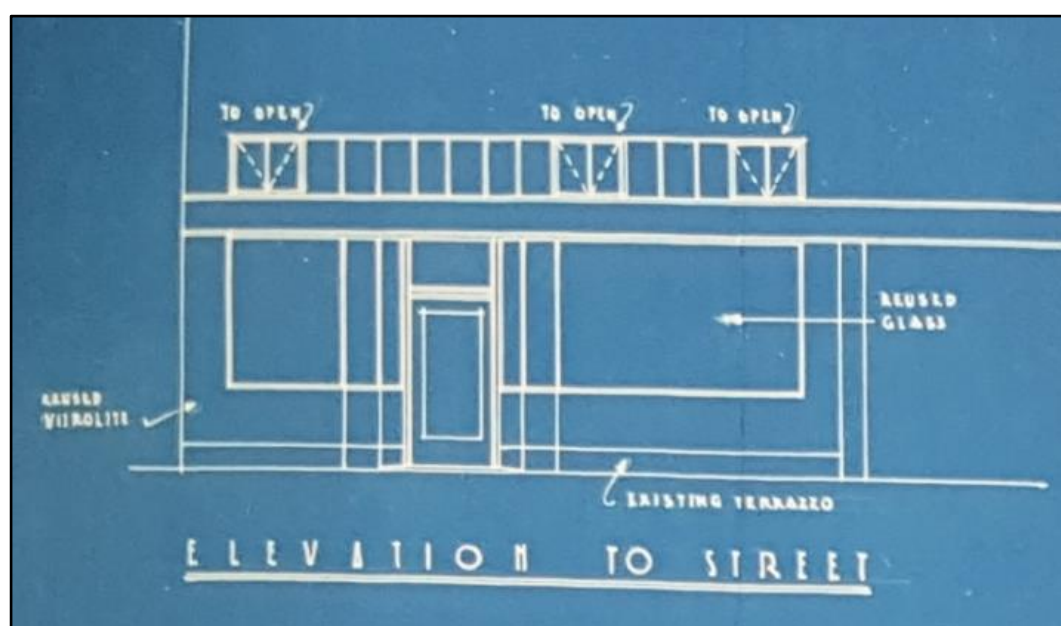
Detail from 1949 plan of alterations to the street façade of the eastern shop in the Temple Chambers at 45-49 Esk Street (Ford Gray & Derby, 1949).
